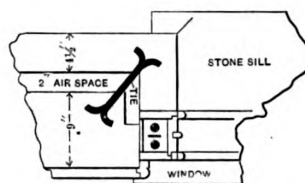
Plan of Part of Window Jamb in Hollow Wall.
